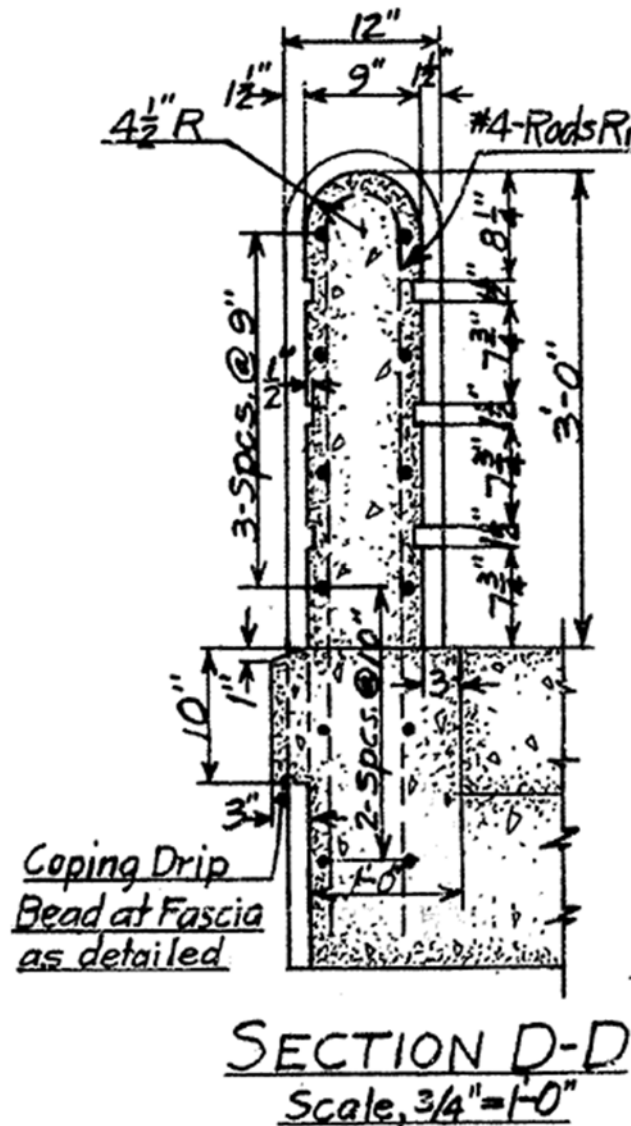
Structure 0118150 – Reinforced Concrete Railing
